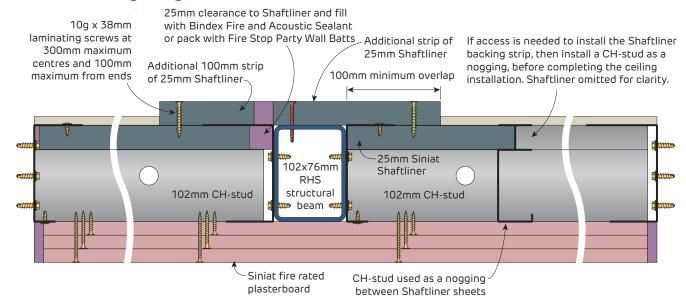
Shaft Wall Ceiling with RHS Structural Beam
